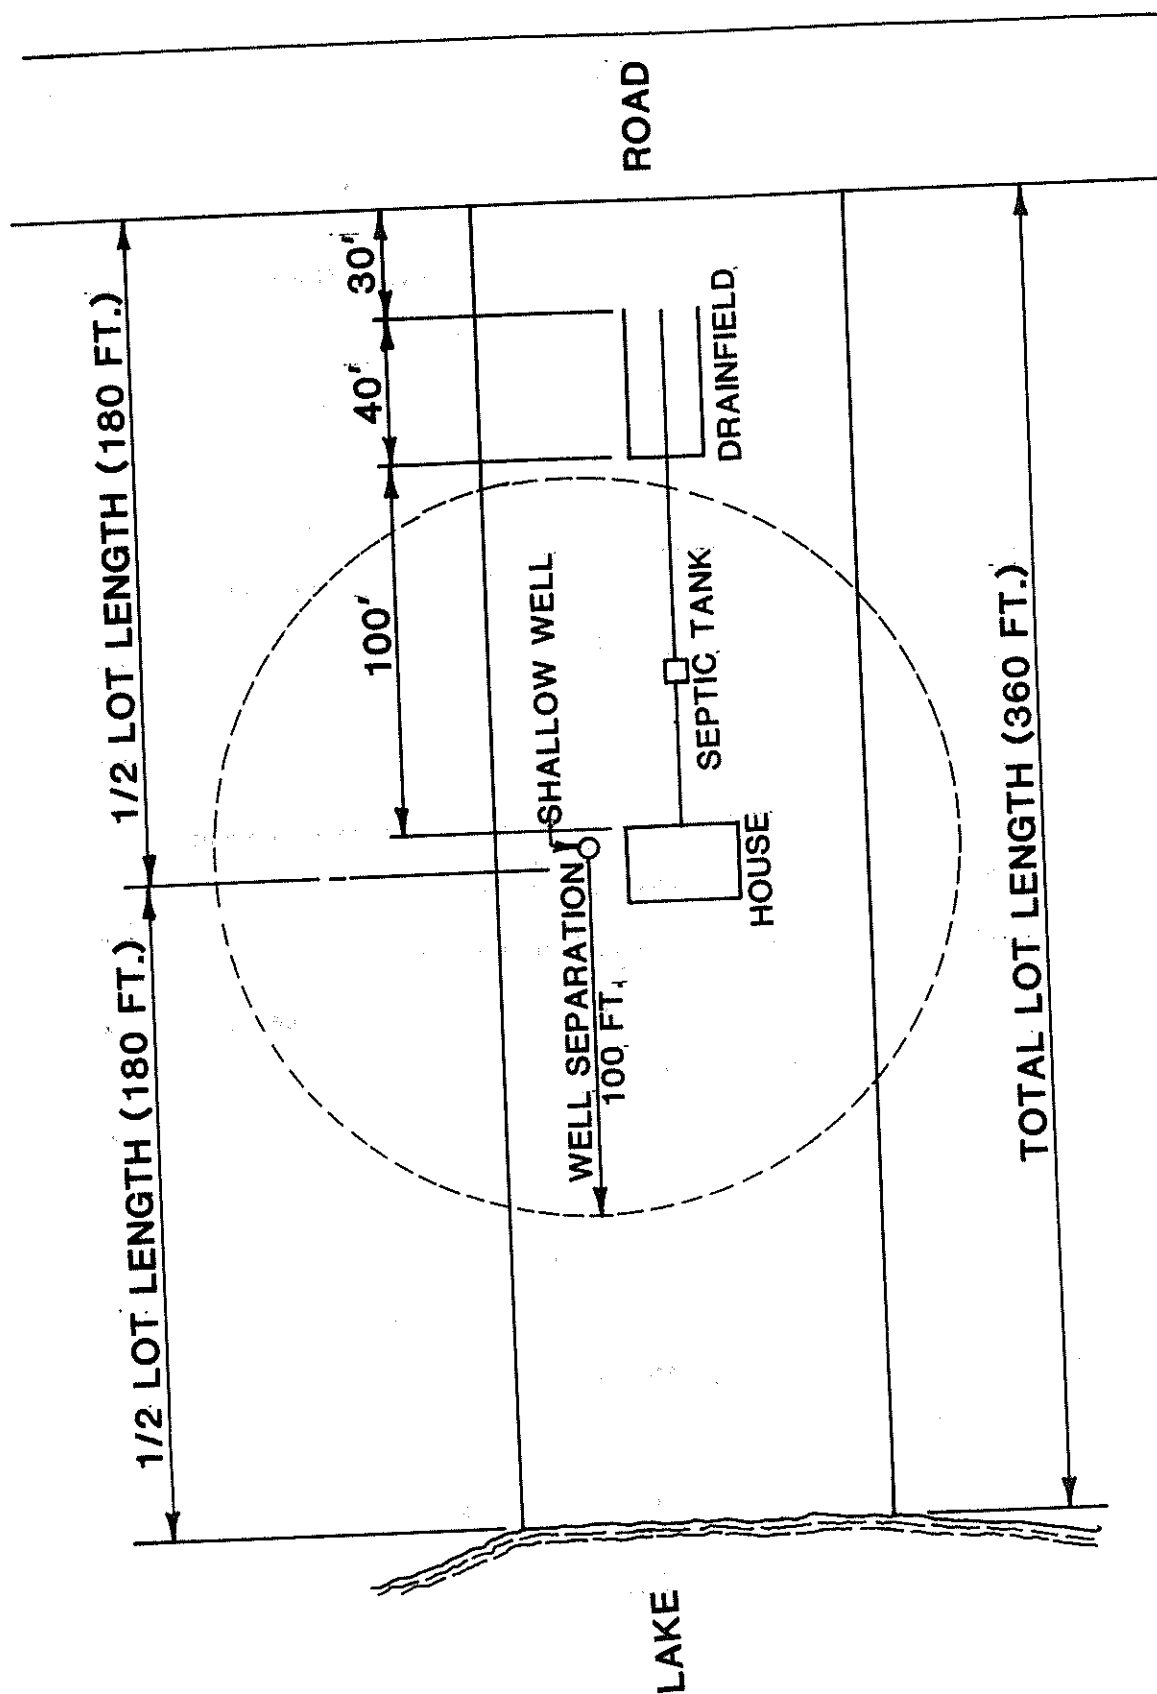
Typical minimum lot size required to meet separation distance for shallow well with house located in center of lot.
